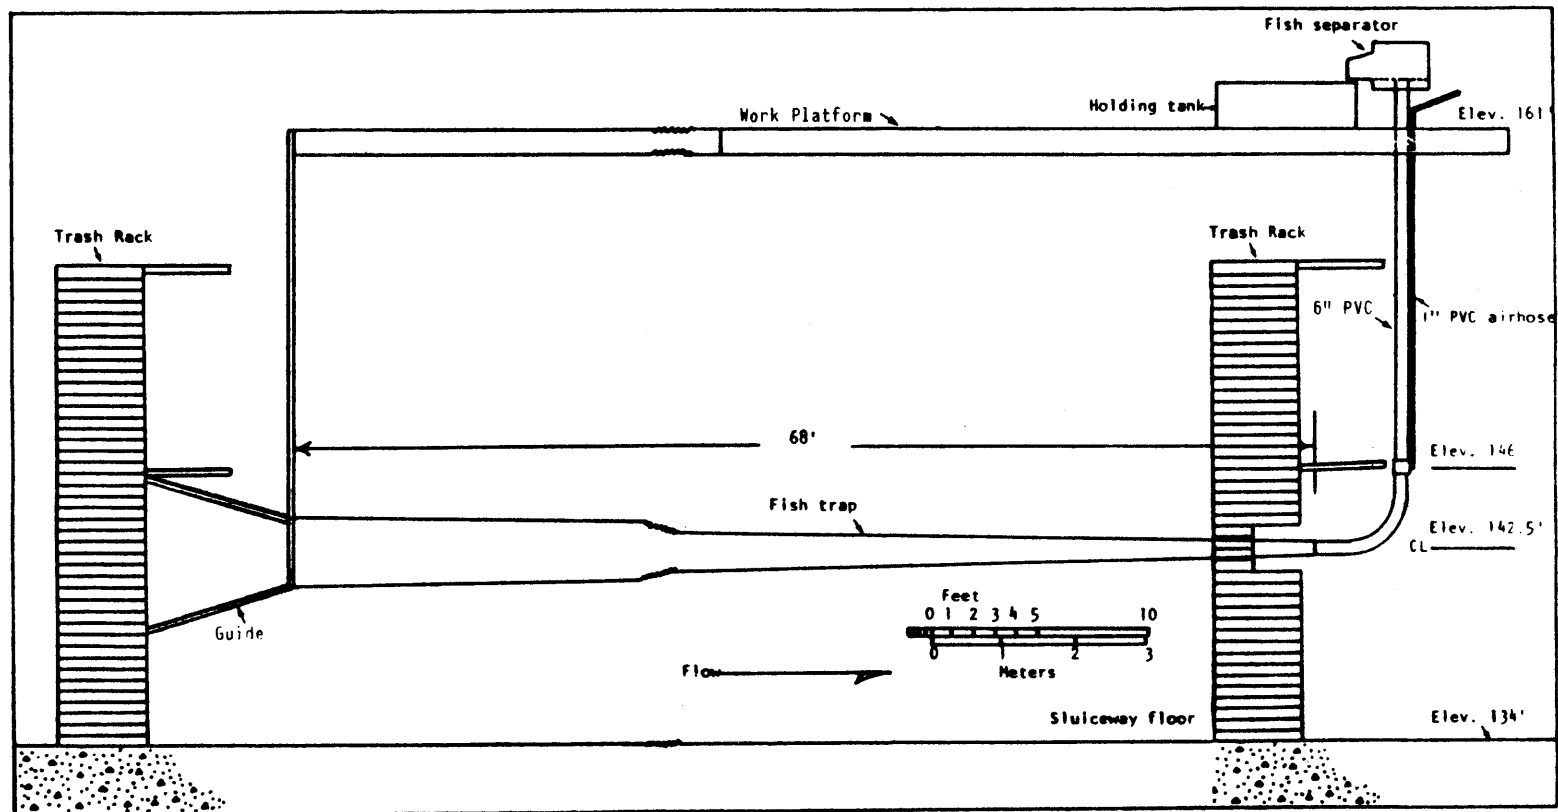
Side view of the sluiceway fish trap and work platform at The Dalles Dam, 1982.
